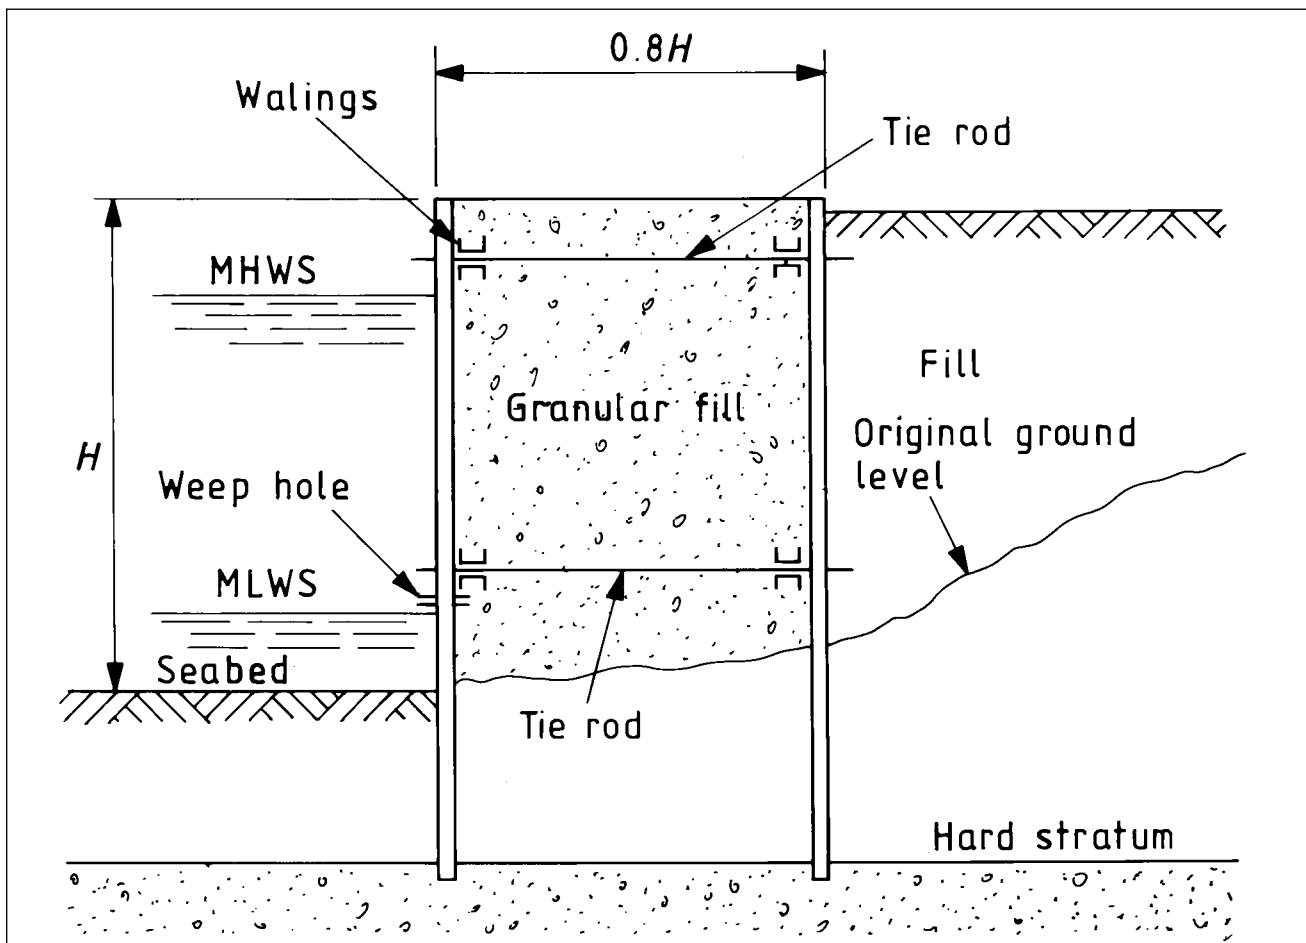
Double-wall sheet pile structures — Sheet piles driven into soil below seabed
